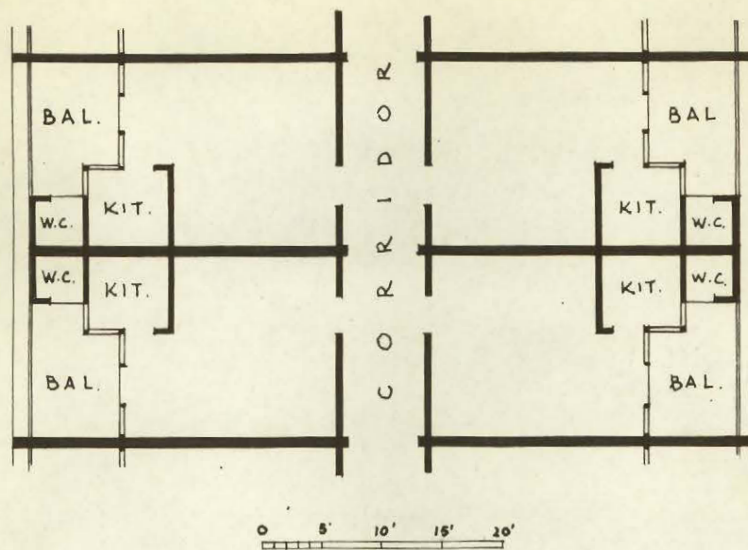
Typical Units and Layout Plan, Ma Tau Wai Estate.
